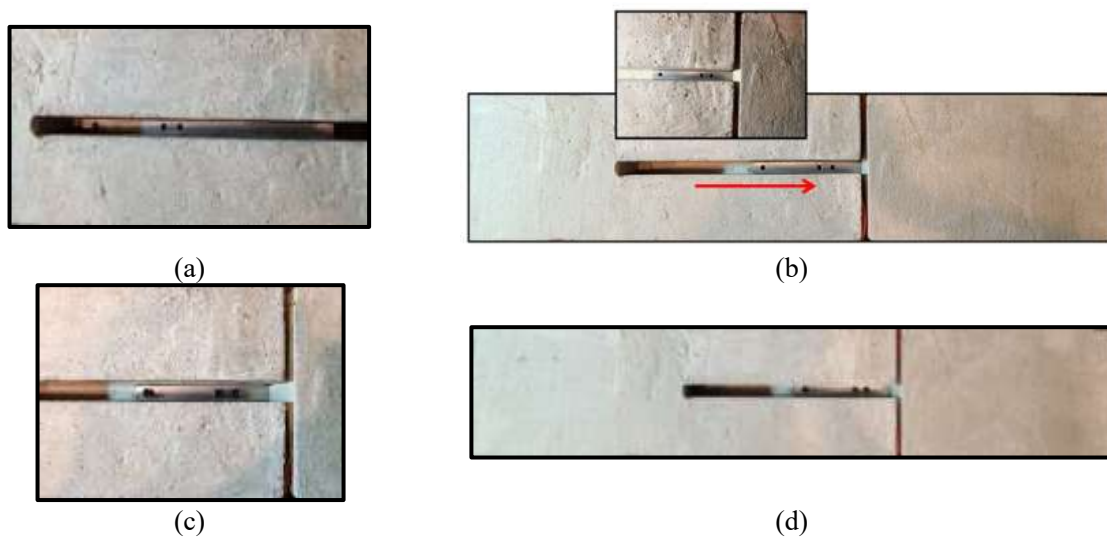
Installation procedures (a) install connection into concrete slot, (b) move connection into embedded tube, (c) install high-strength bolts, (d) complete installation.
